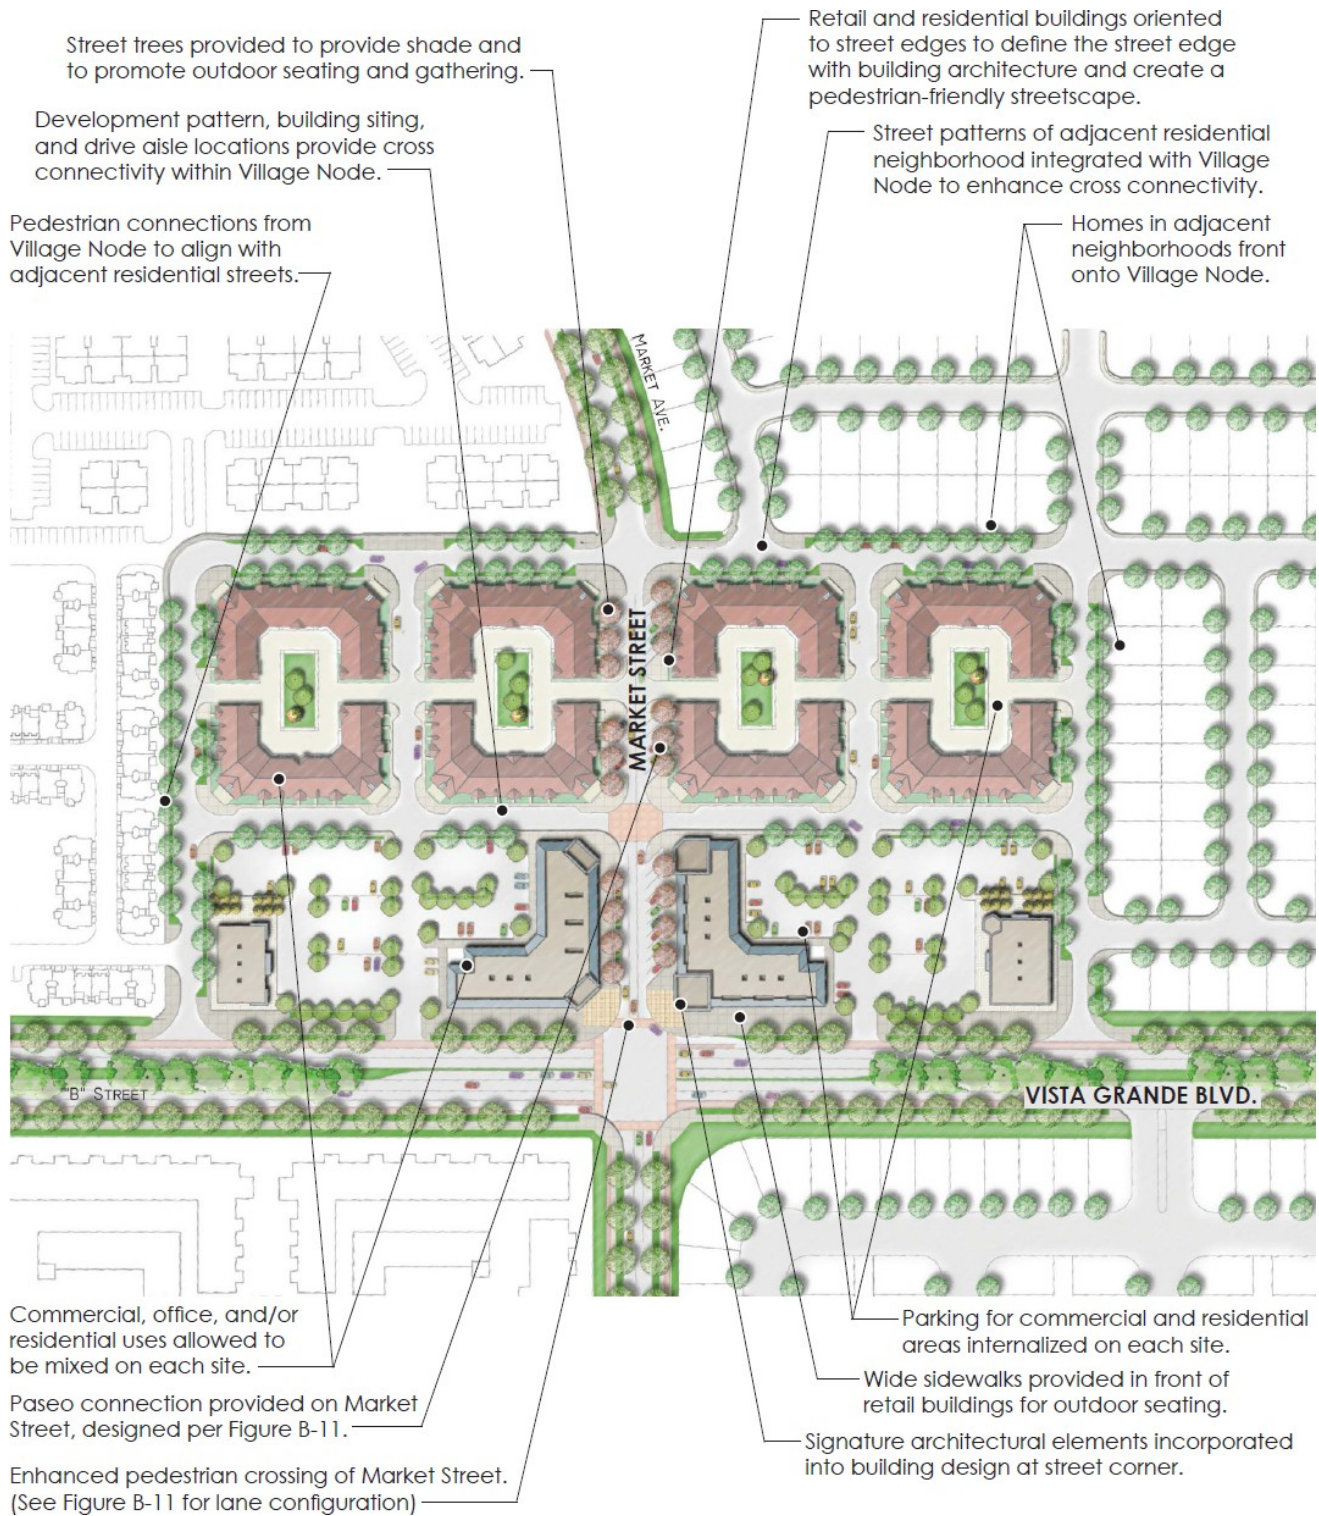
Concept Plan for Market Street Village Node (Parcels DF-41 & JM-40)
